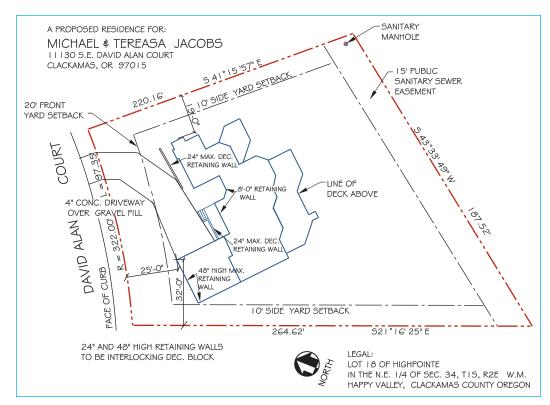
If grading is extensive, the site plan is separated from the grading plan. By careful use of layers, this site plan was used as a base for the grading plan in Figure 1.14.
